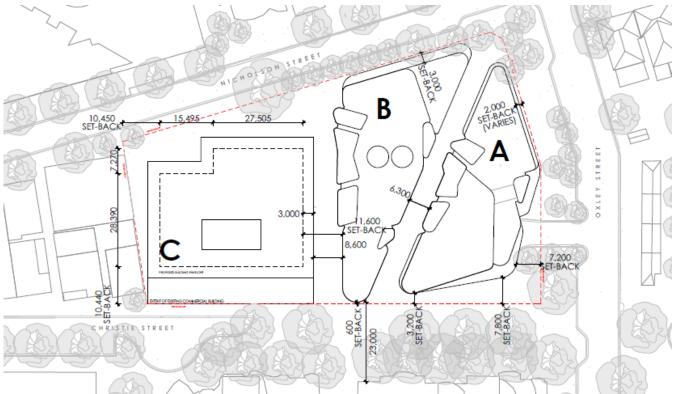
Proposed setbacks (Source: Drawing DA-05, Fitzpatrick + Partners).
